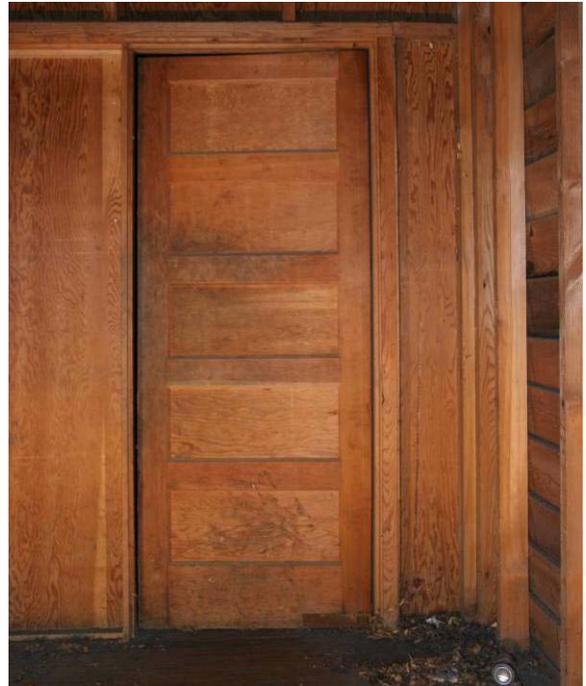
Interior five-paneled door at north wall of Room 101.
